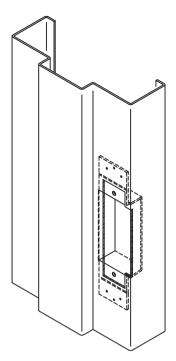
Mortise Strike Preparations on Door Frame (Source: Courtesy of Ceco Door)
